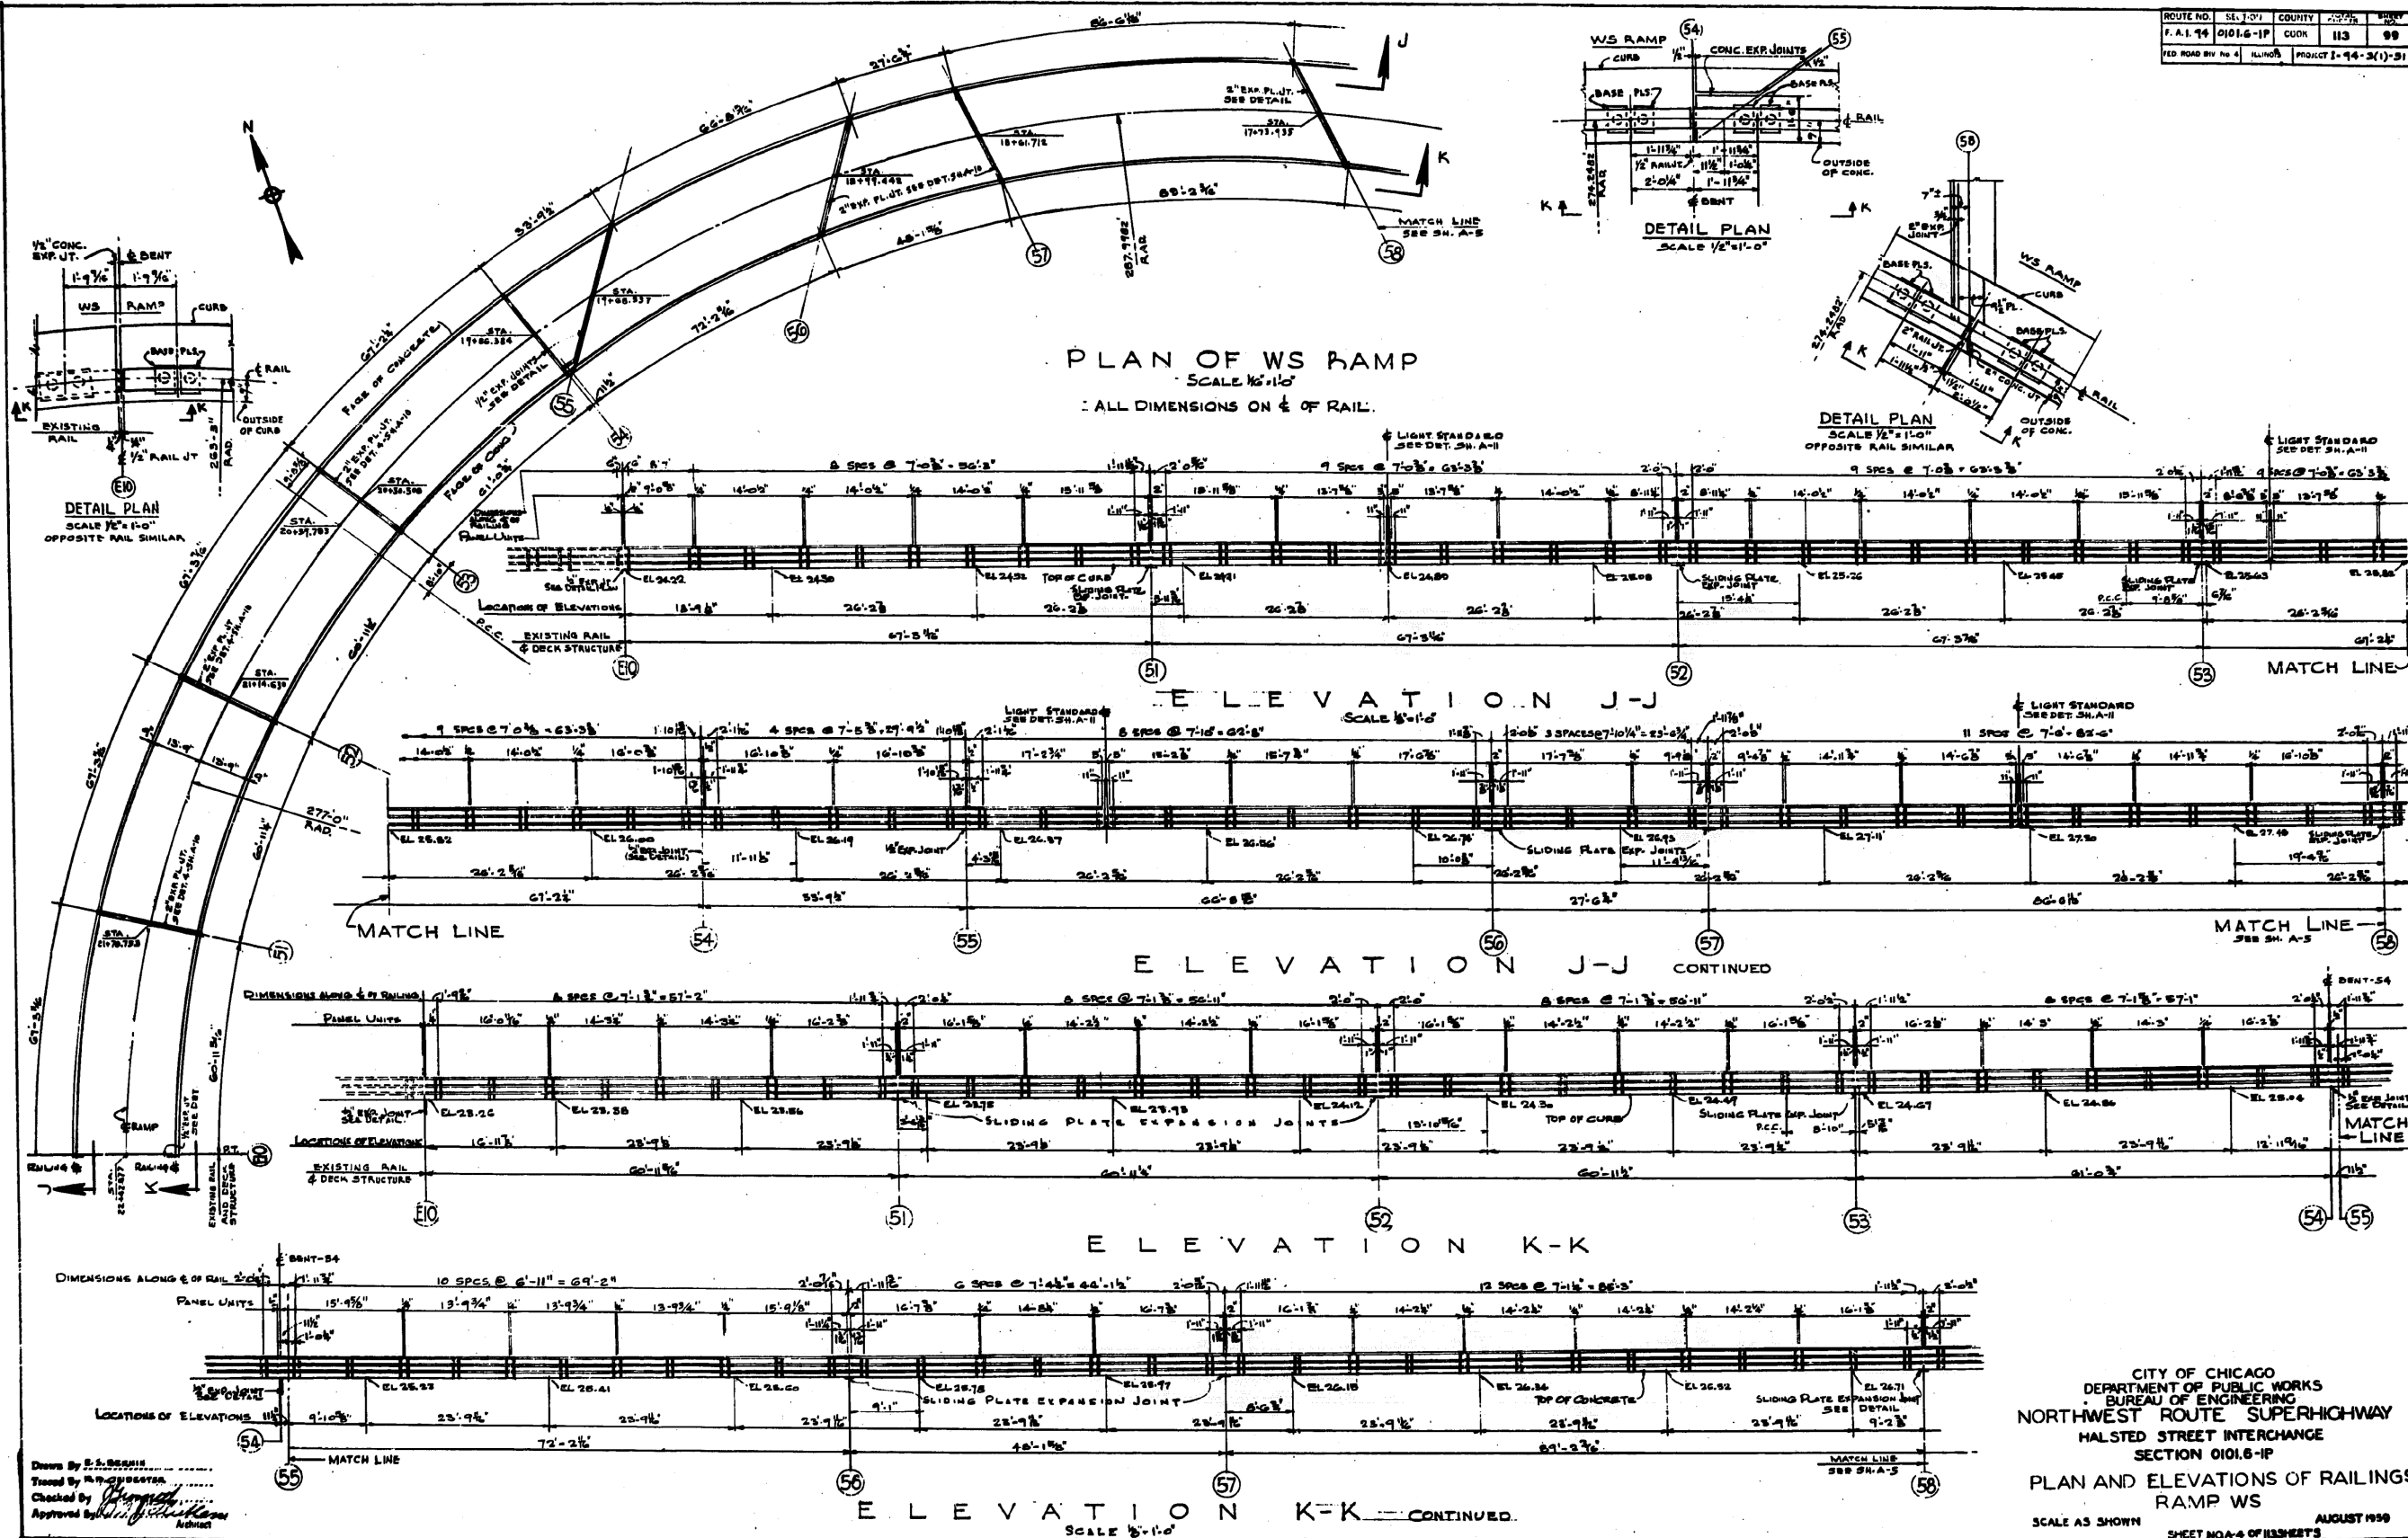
DETAIL PLAN (OPPOSITE RAIL SIMILAR)
